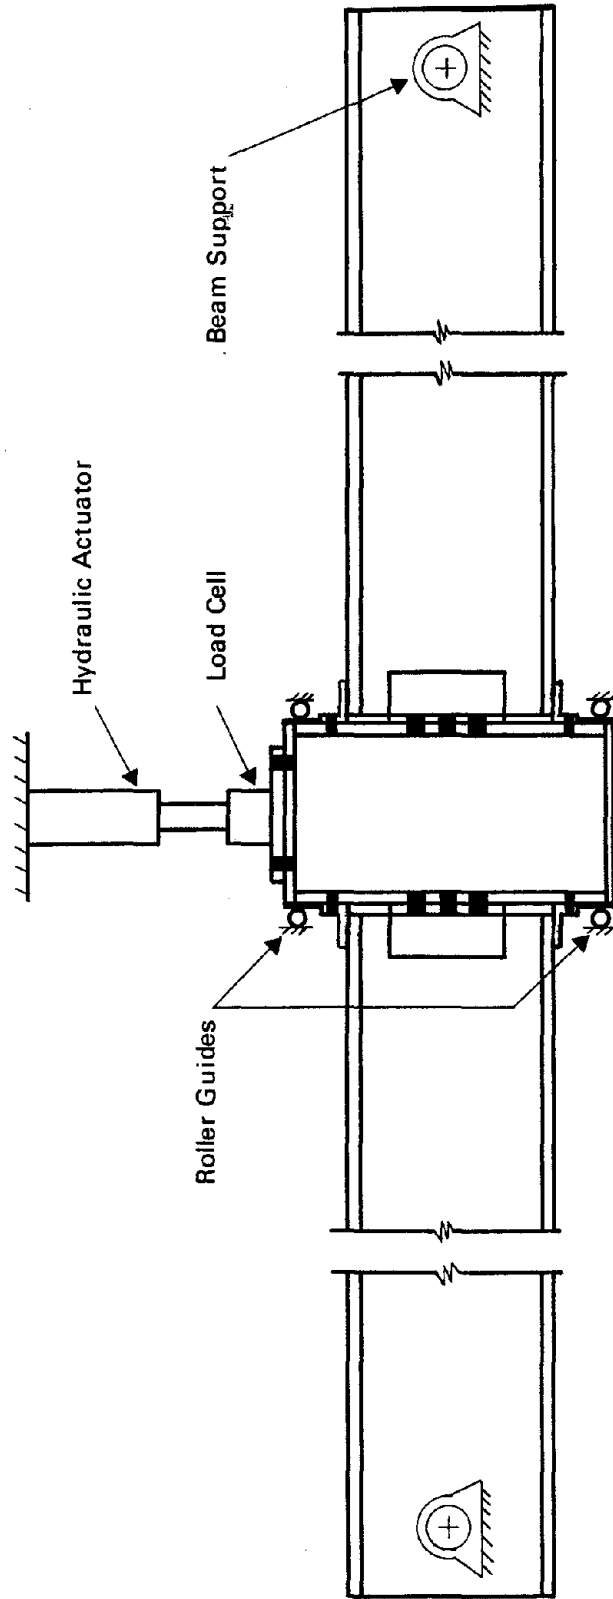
SCHEMATIC OF LOADING SYSTEM FOR TEST BEAMS
